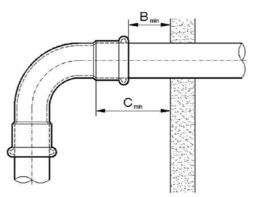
Minimum distance from wall/floor to front of press fitting (B) and socket end from wall (C) for sizes  $d \le 54$  mm (see Table 16)
